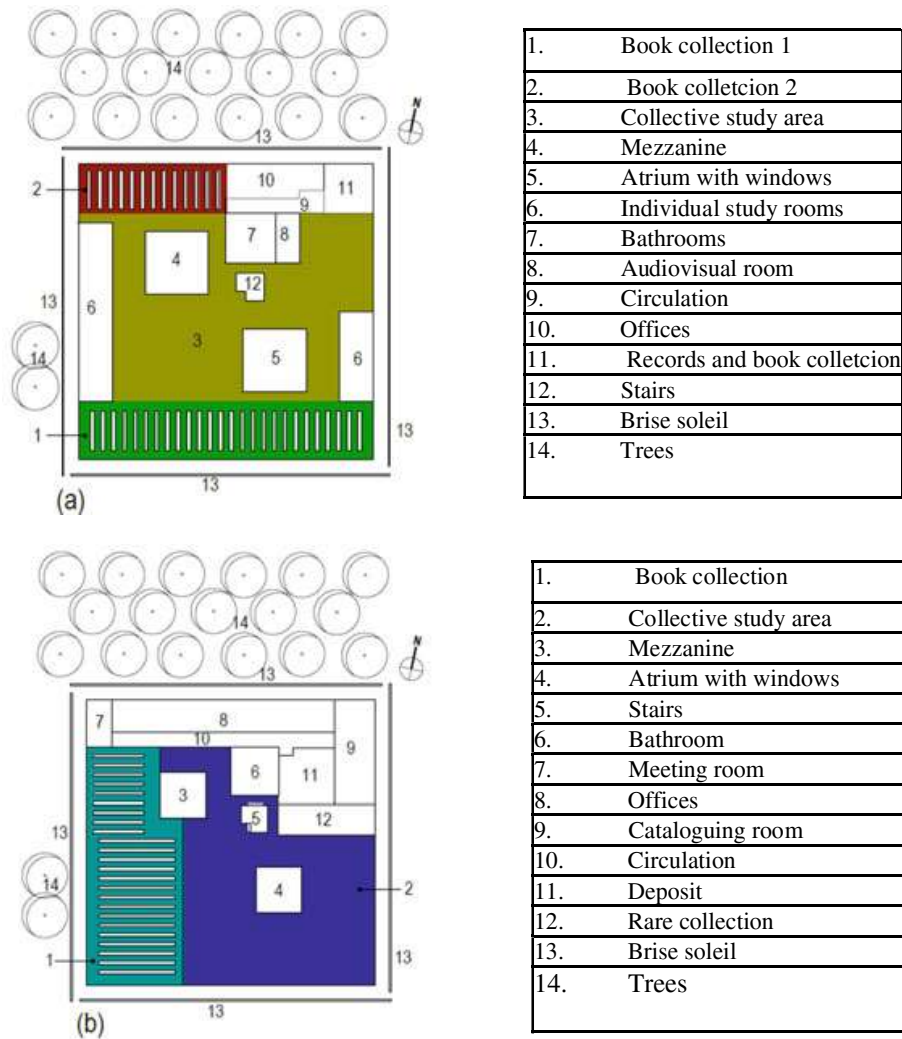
Spaces analyzed in the hatch, a 1st-floor plan, b 2nd-floor plan. (Authors 2022)
